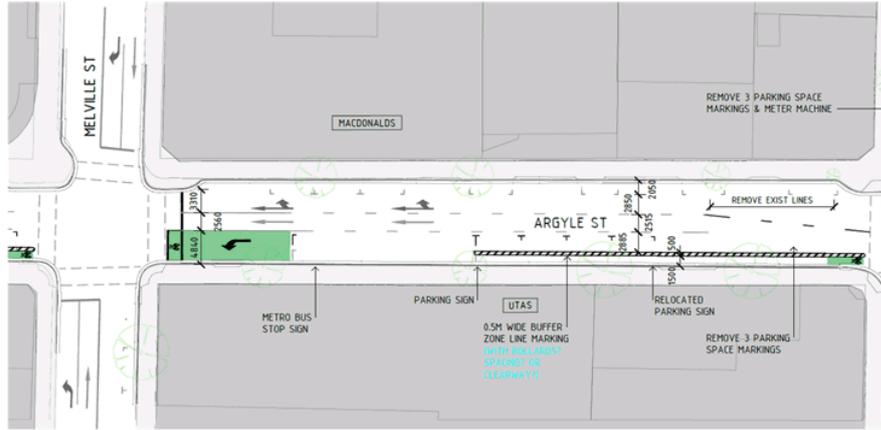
Argyle Street (Bathurst Street to Melville Street)
